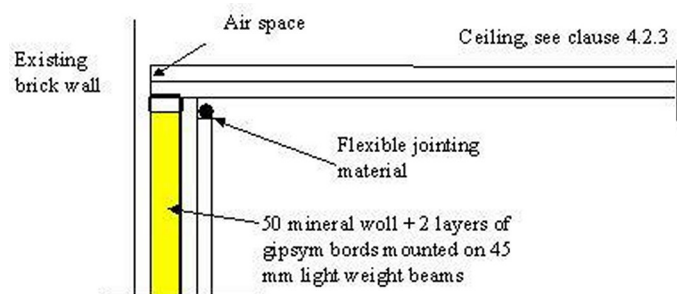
Additional sound insulation of the existing wall and connection against ceiling.
